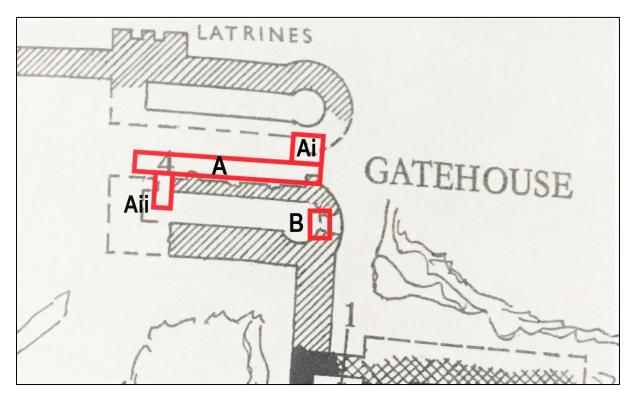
Plan of gatehouse and eastern curtain wall from Cathcart 1974, with proposed trenches marked in red
